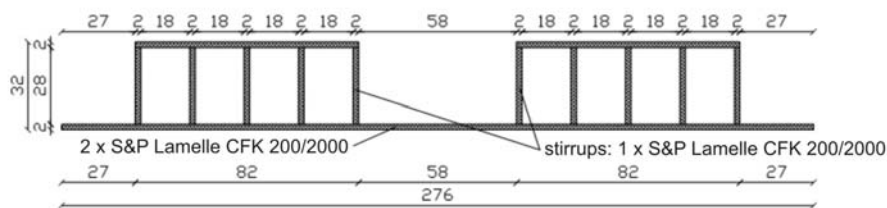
Scheme of the reinforcement with CFRP lamellas.
